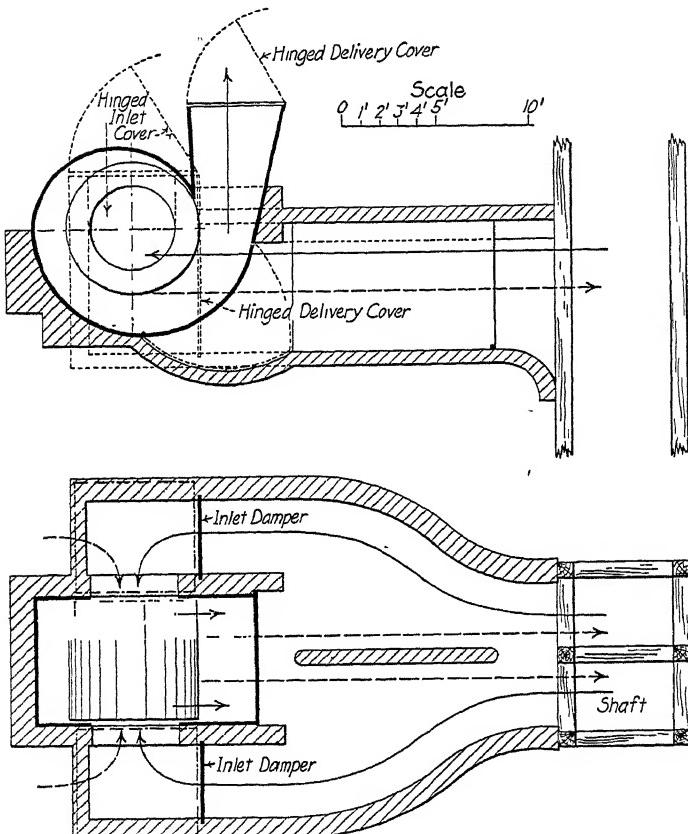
ARRANGEMENT OF AIR DUCTS, DOORS, ETC., FOR REVERSING VENTILATING CURRENTS.
